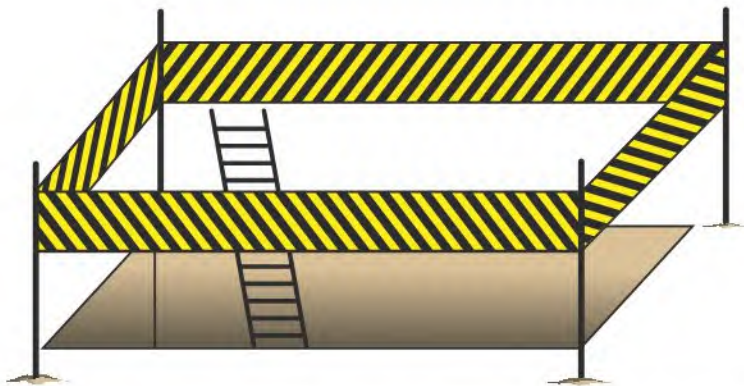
Place a barricade around a trench and use a ladder to enter and exit the trench.
